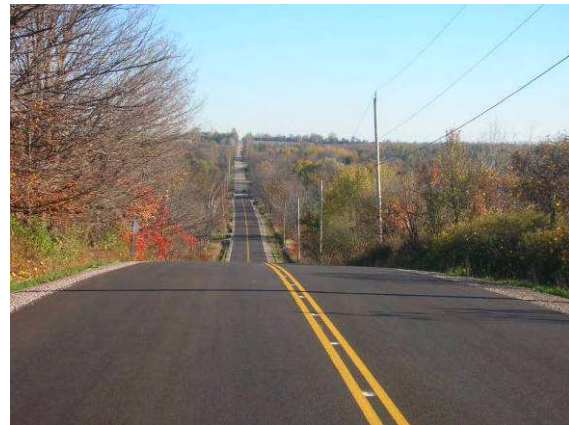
33: Business along Campbellville Road      Photo 8 - 34: 'Roller-coaster' alignment along this route link on Campbellville Road
